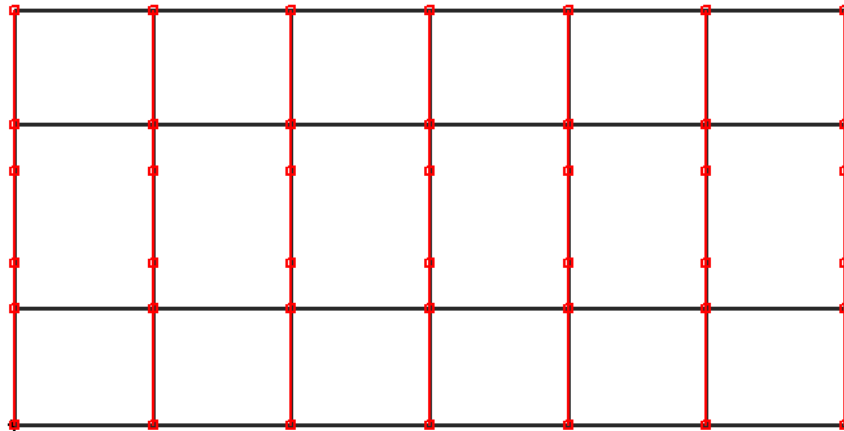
Typical floor plan with transverse beams highlighted in red
